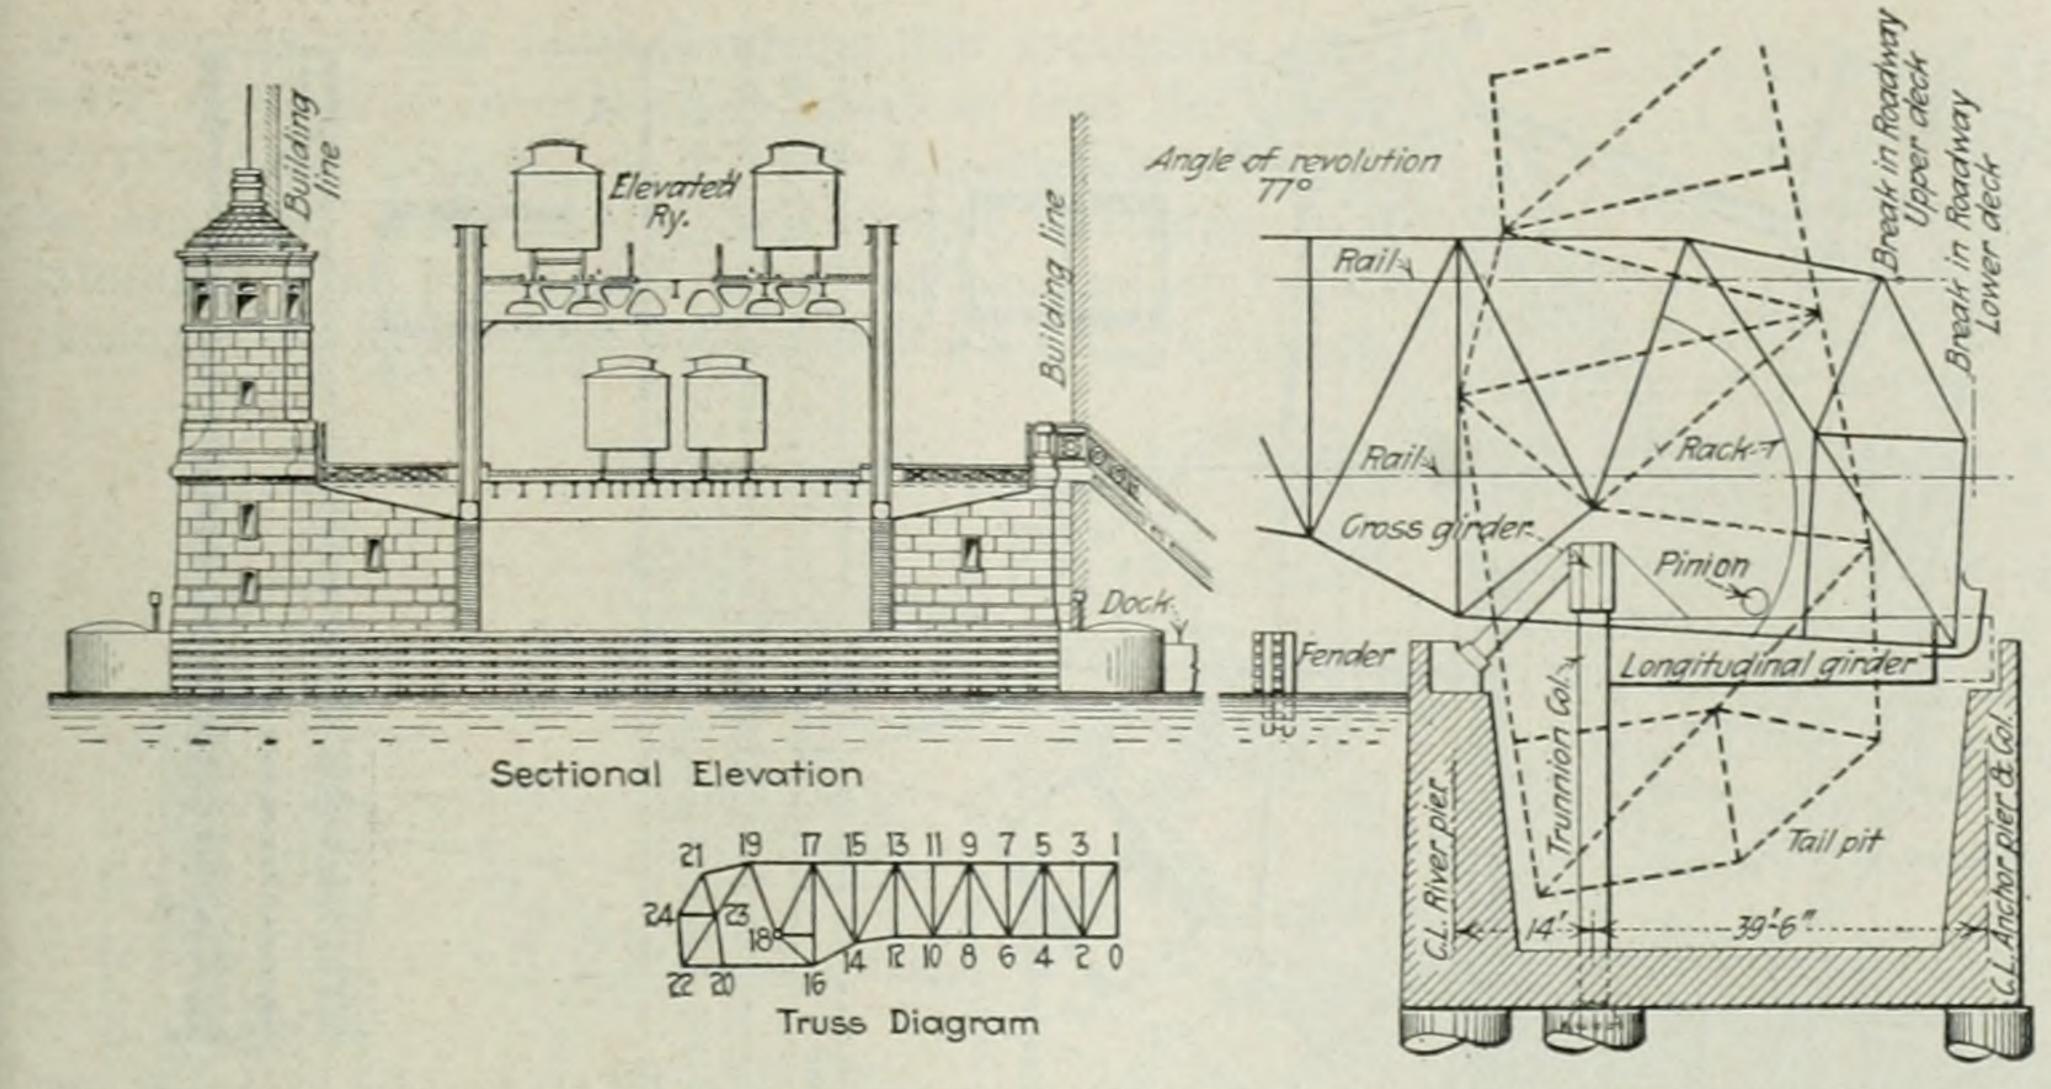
CROSS-SECTION AND SECTIONAL END ELEVATION
